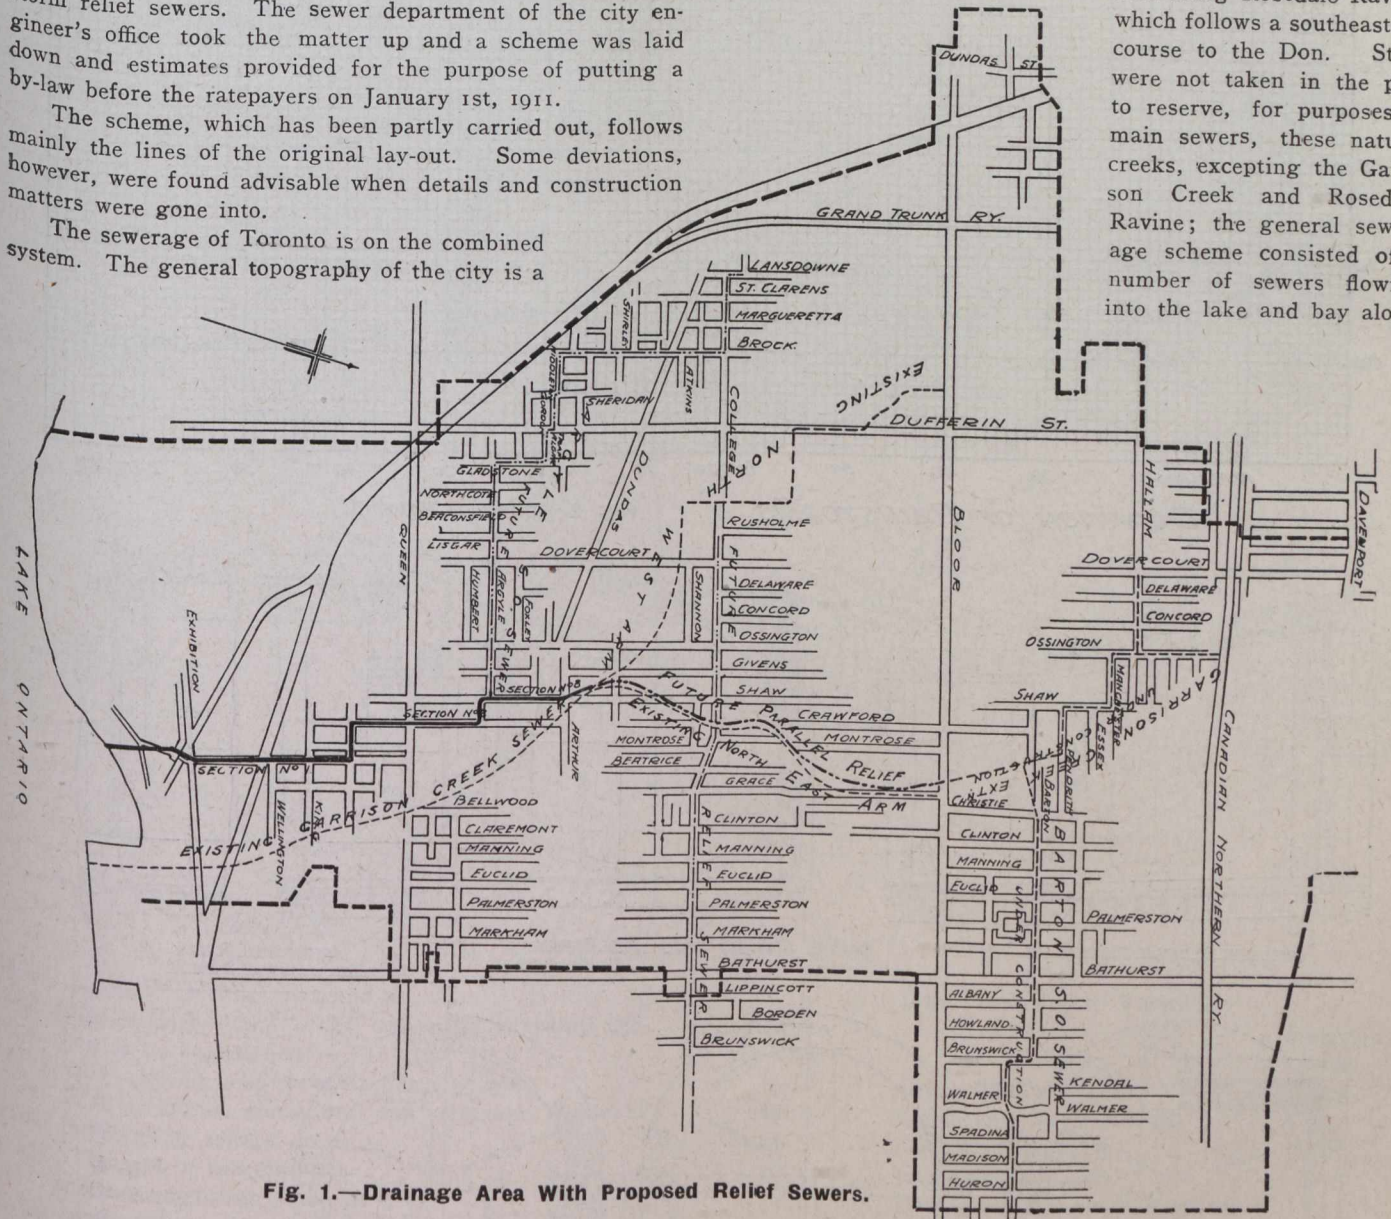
Drainage Area With Proposed Relief Sewers.
